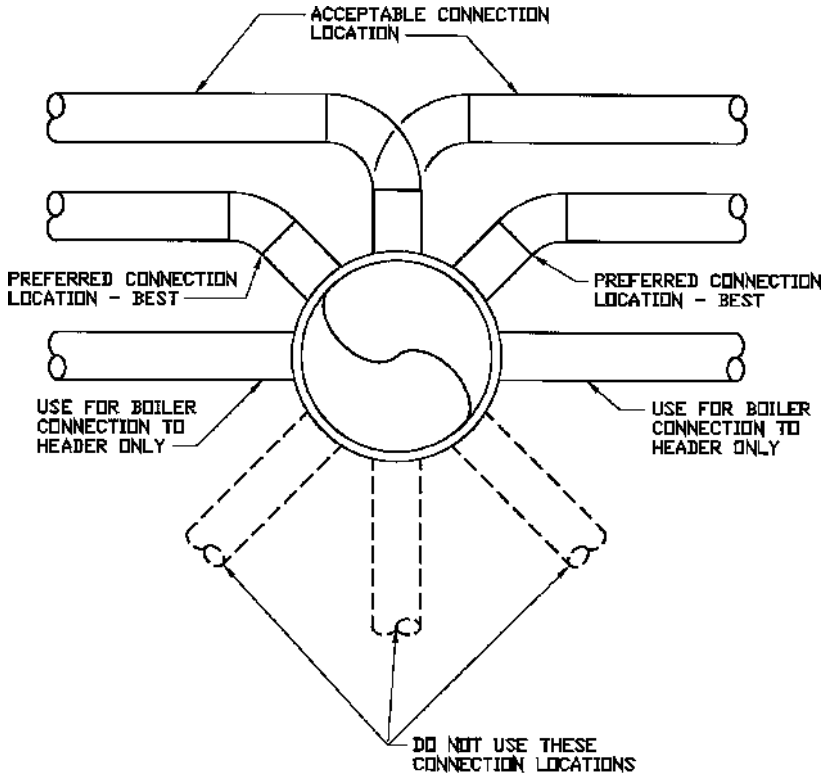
STEAM PIPING CONNECTIONS.
